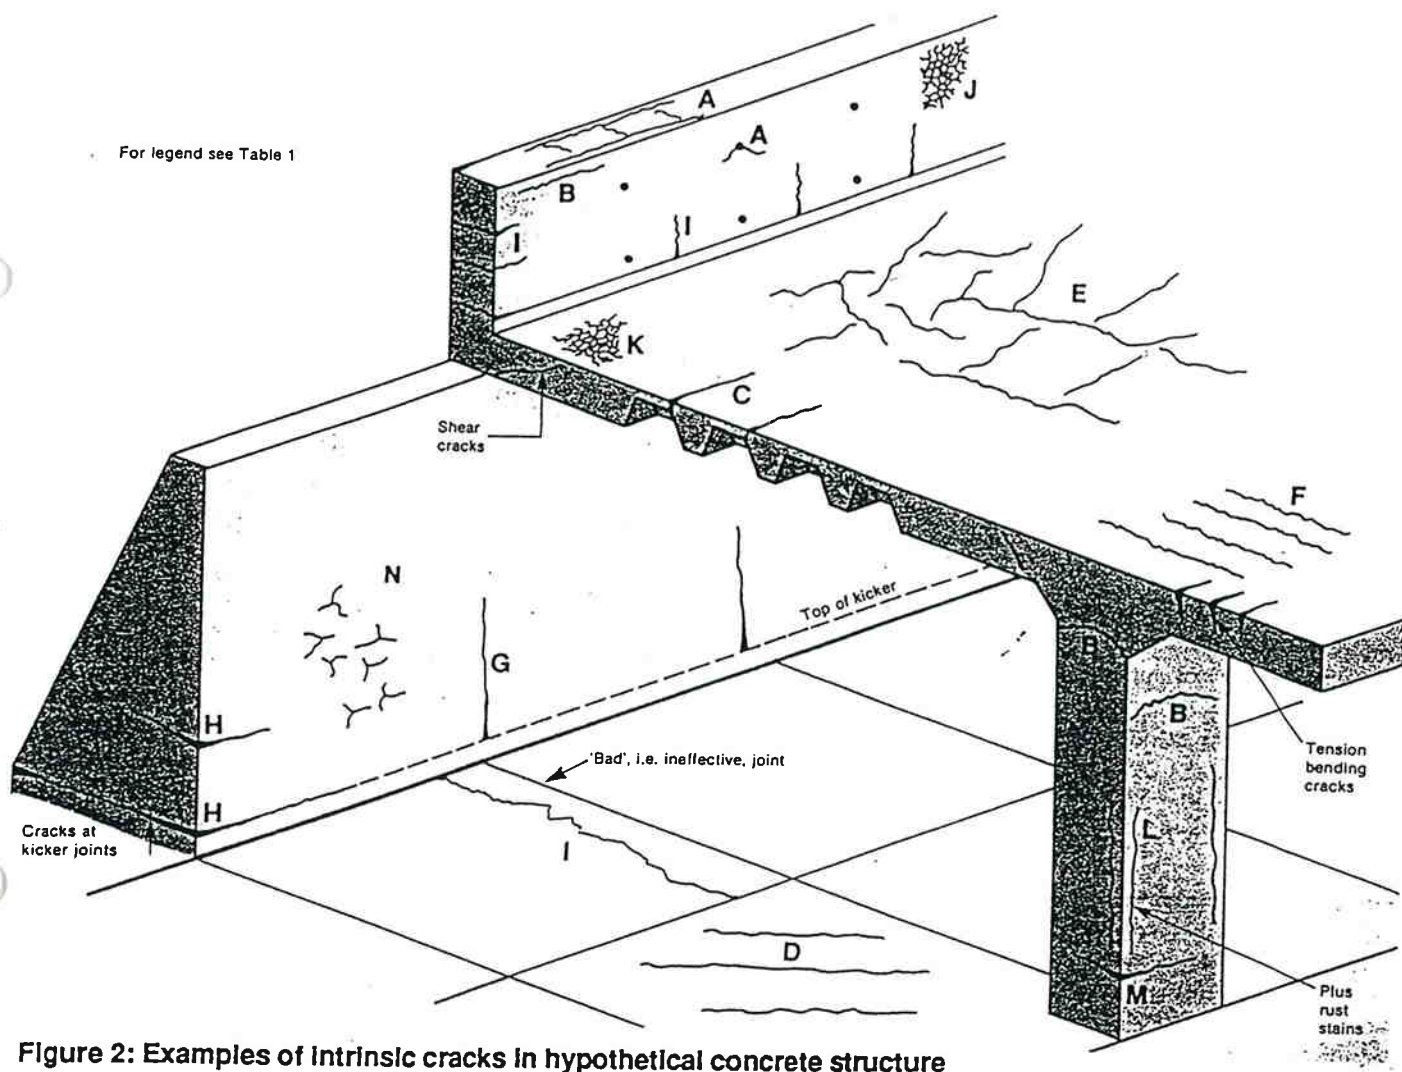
Examples of intrinsic cracks in hypothetical concrete structure
